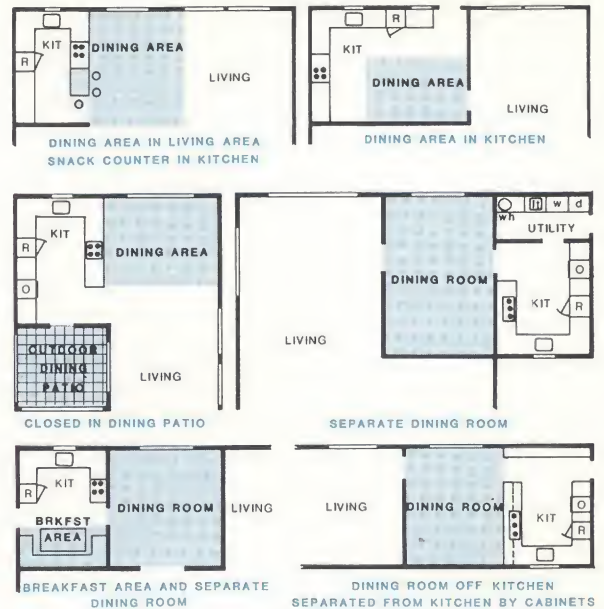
Plans showing the location of dining facilities in many different areas.
